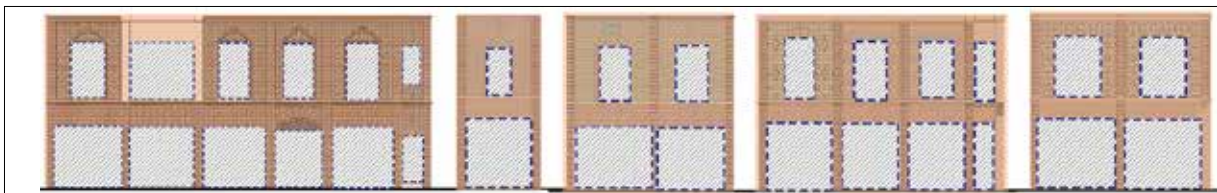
Separation of surface and width of façade sections in Bala 'and Paein Khiaban 'urban walls .As it can be seen in the picture ,the width of the facade through the urban wall includes different dimentions ,for example ,one building facade is devided into two ,three or even six sections .Source :Authors according to Afifi and Talaei2014 ,
